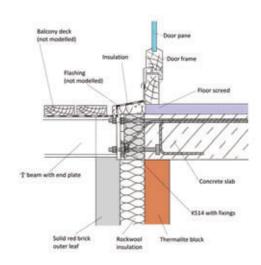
Schöck KS14 unit used with masonry wall and concrete slab
